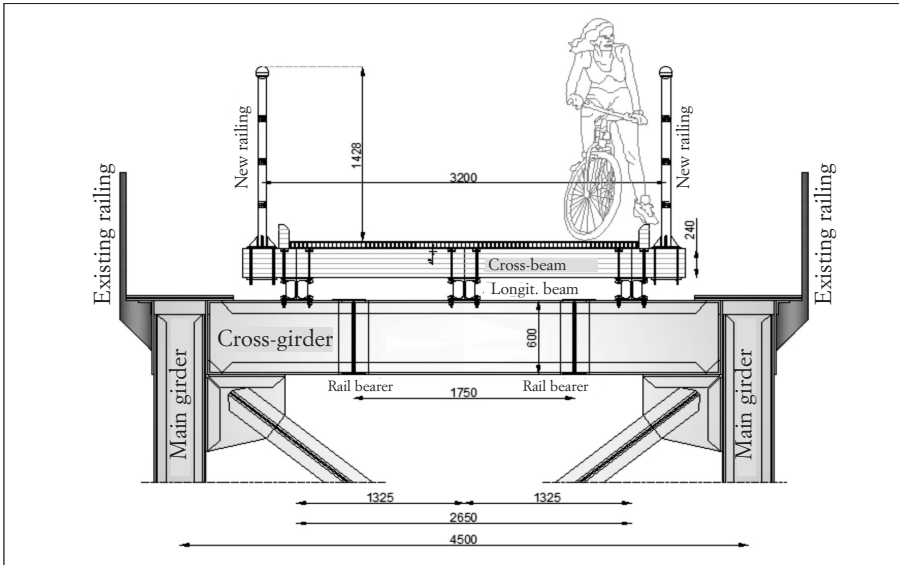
Typical cross section of the new decking, showing the wooden cross-beams being supported on three points.
